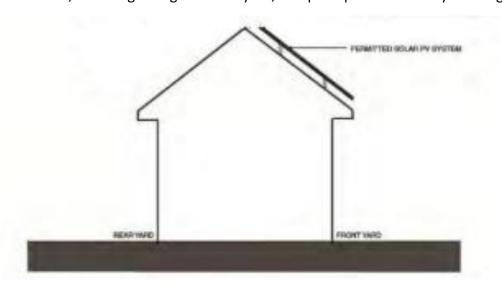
Illustration of flushed mounted panel facing front yard.
